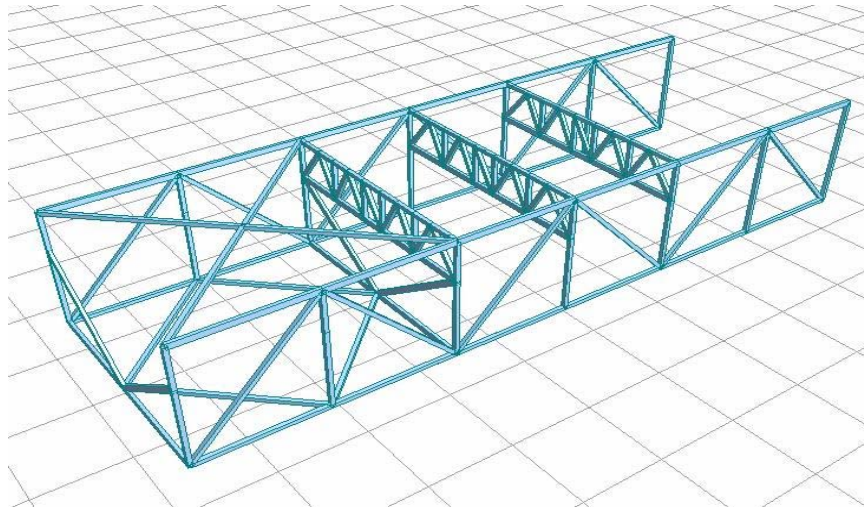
Section of the Second Tacoma Narrows Bridge Suspended Structure.
